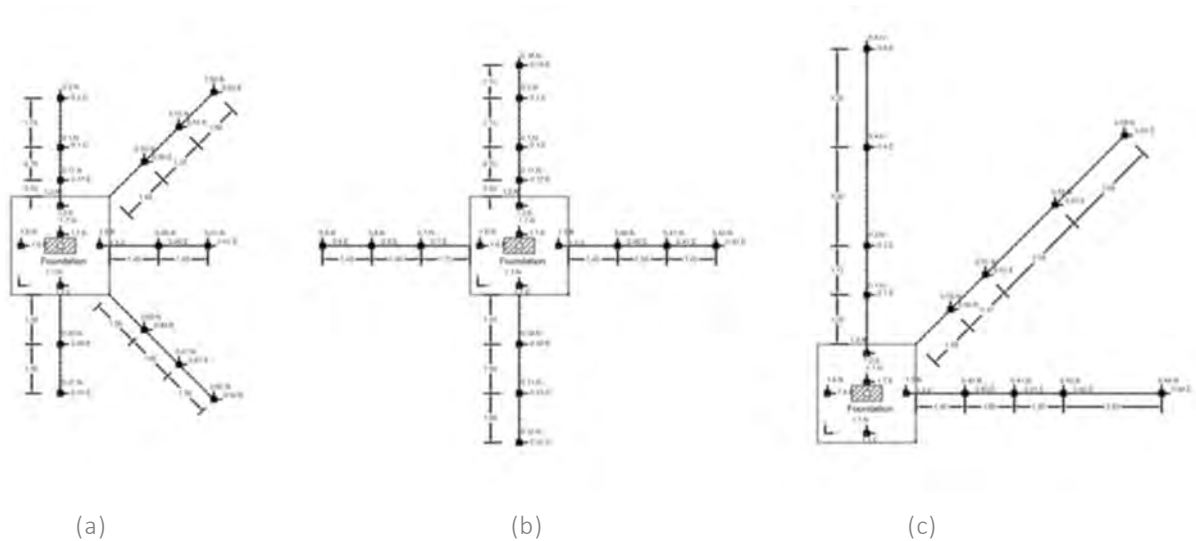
Plan view of the three different instrumentation layouts (a), (b) and (c) of the soil surface around EUROPROTEAS structure
